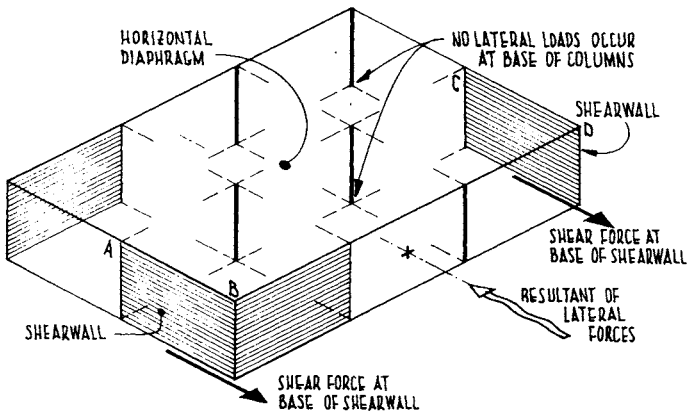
Loads on a Diaphragm-shearwall Structure
